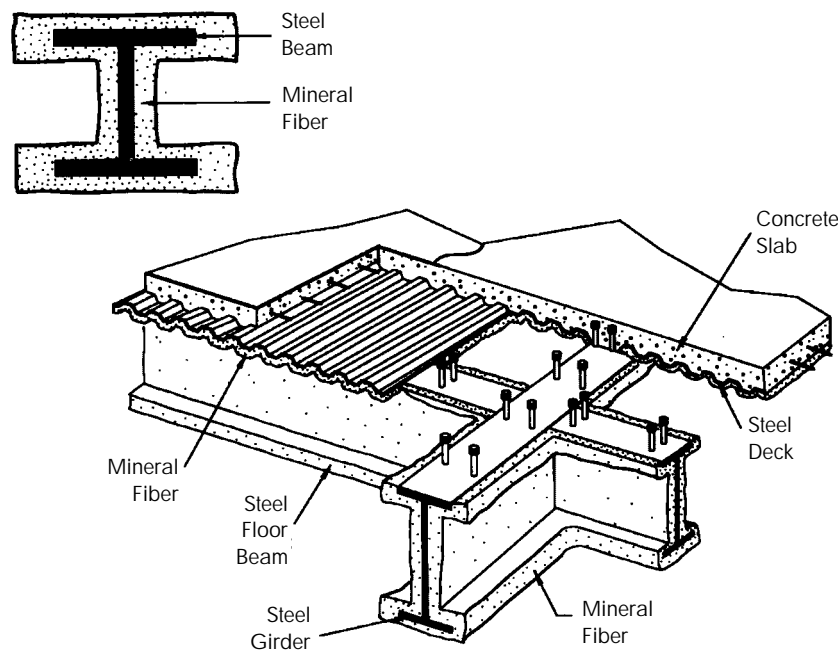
Mineral fiber spray applied to beam and girder floor system with steel floor deck supporting a concrete slab. Illustration courtesy of the American Iron and Steel Institute, *Designing Fire Protection for Steel Beams*.
